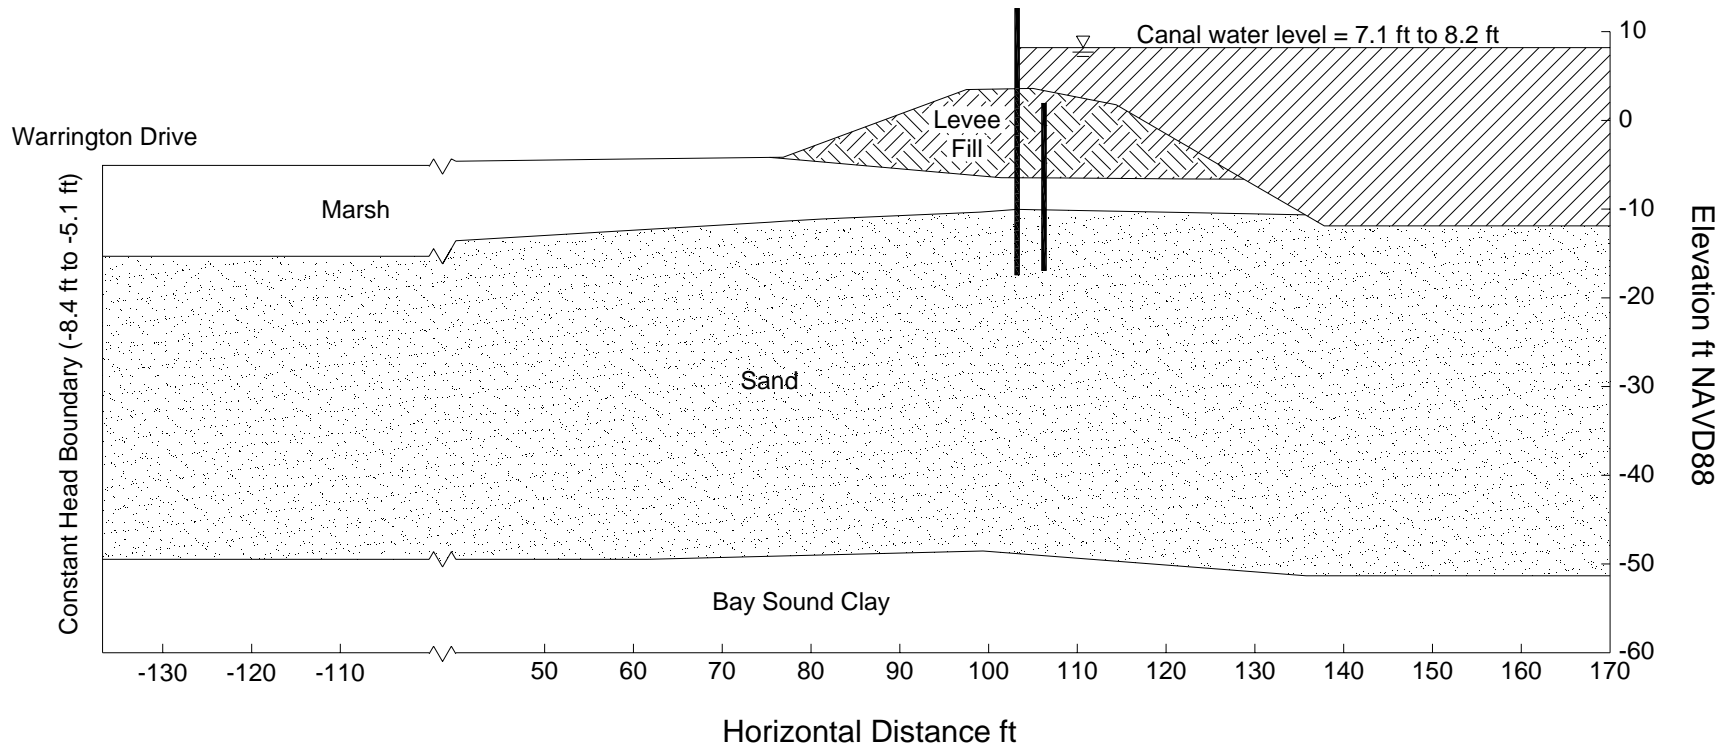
Schematic cross section at London South breach, with seepage boundary conditions.
